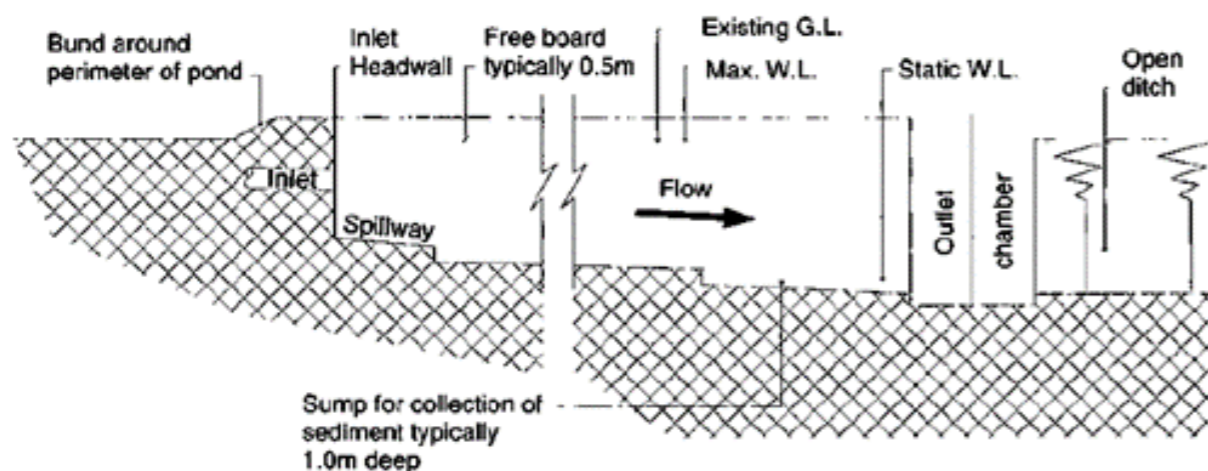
Typical Silting Pond Detail (CIRIA C532 Control of water pollution from construction Sites)
